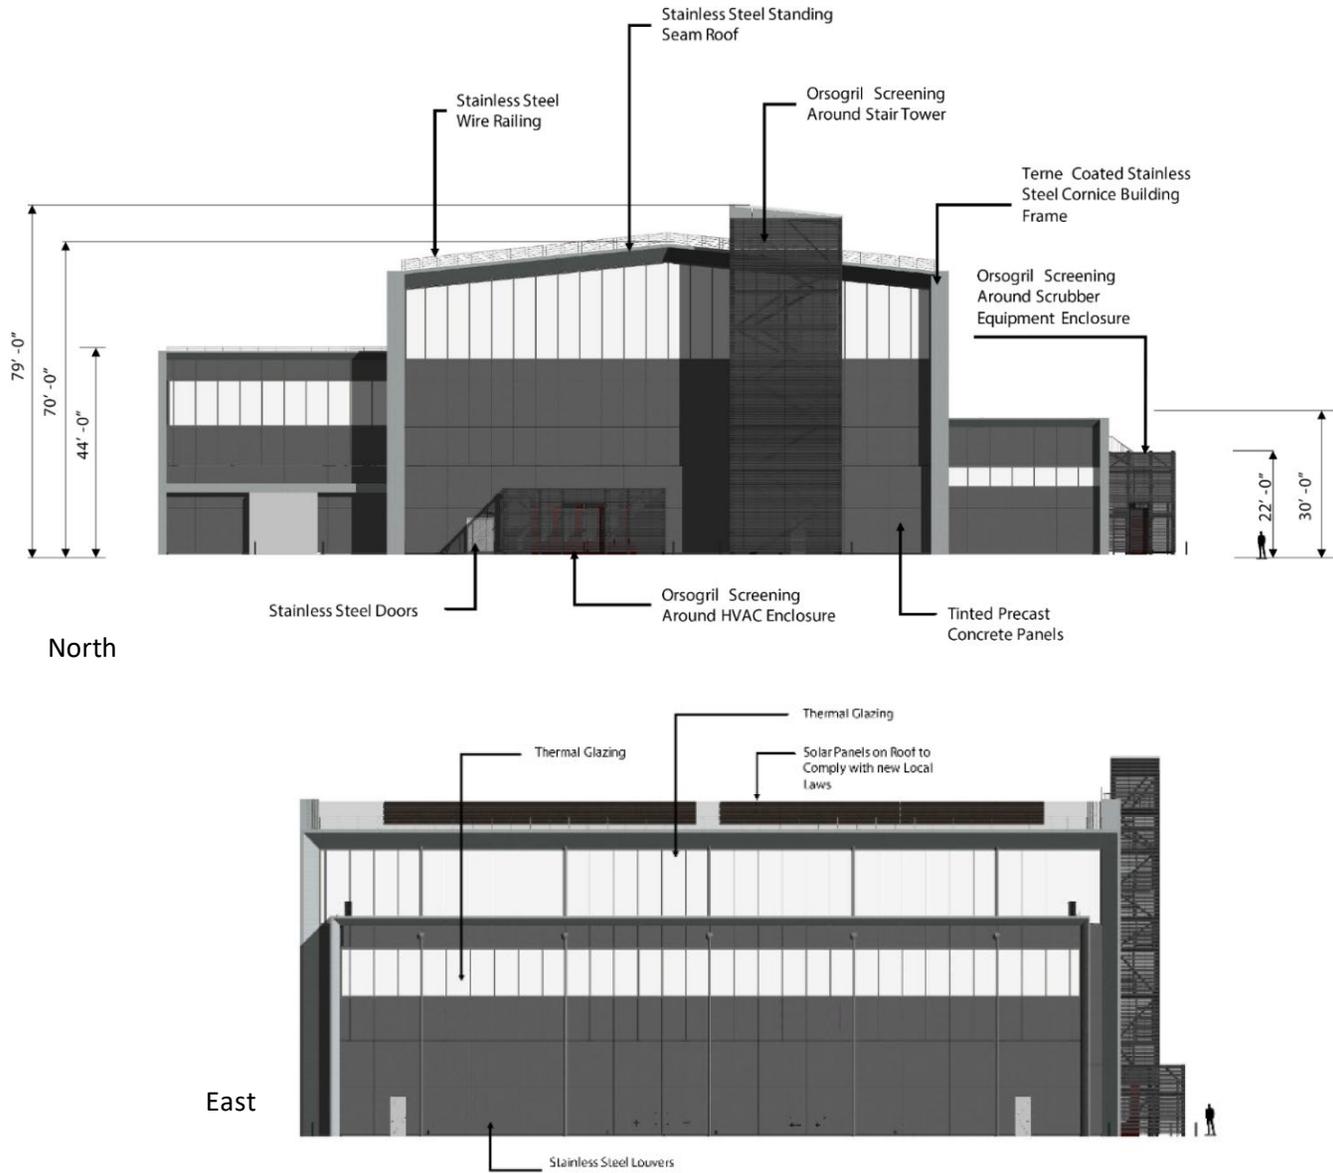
KEC Screen Chamber – North and East Elevations
